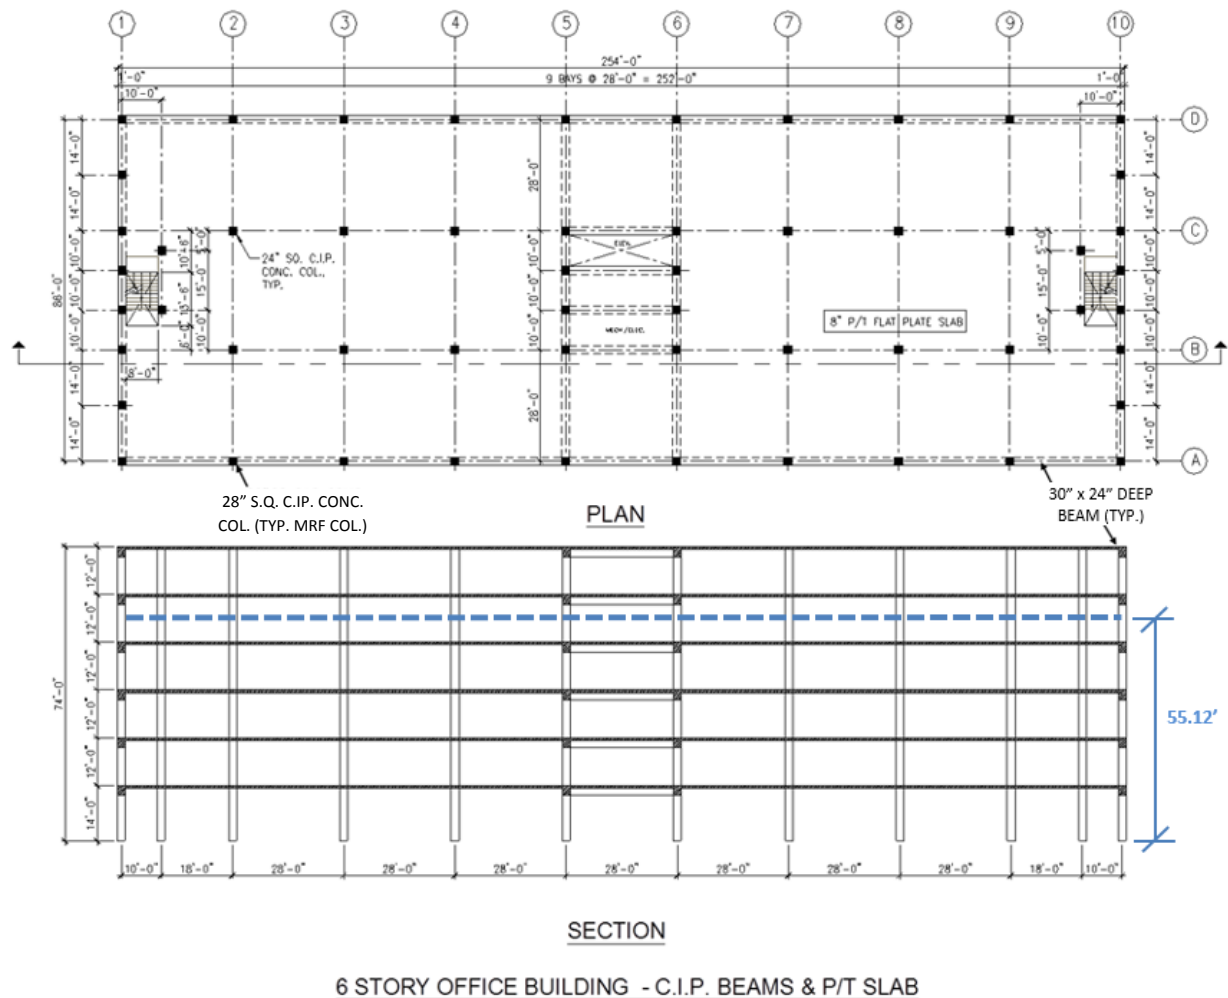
6-Story Office Building using Special Reinforced Concrete Moment Frames and posttensioned flat slab supported on gravity columns
